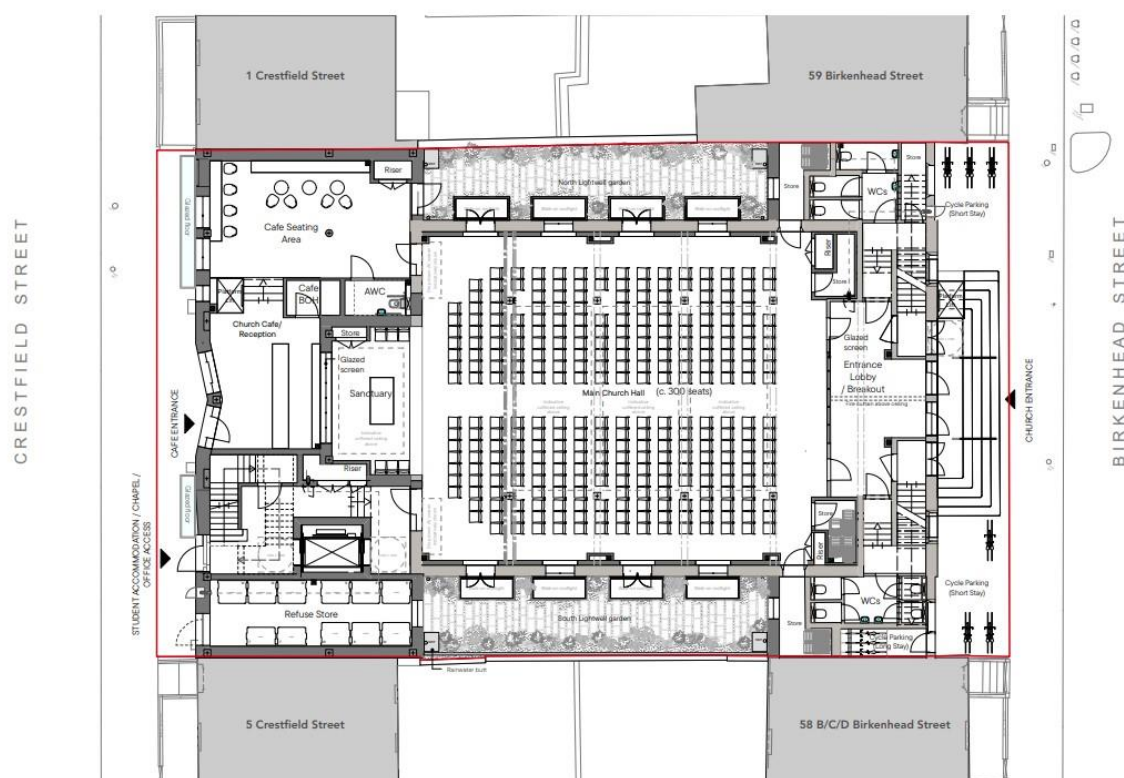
Proposed Ground Floor Plan of the Proposed Development (Matthew Lloyd Architects)
